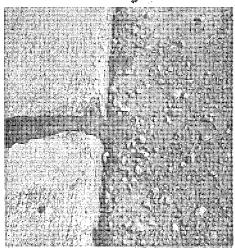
Settlement. Reduction in elevation of short sections of pavement or structures due to their own weight, to the loads imposed on them, or to shrinkage of the supporting soil.
